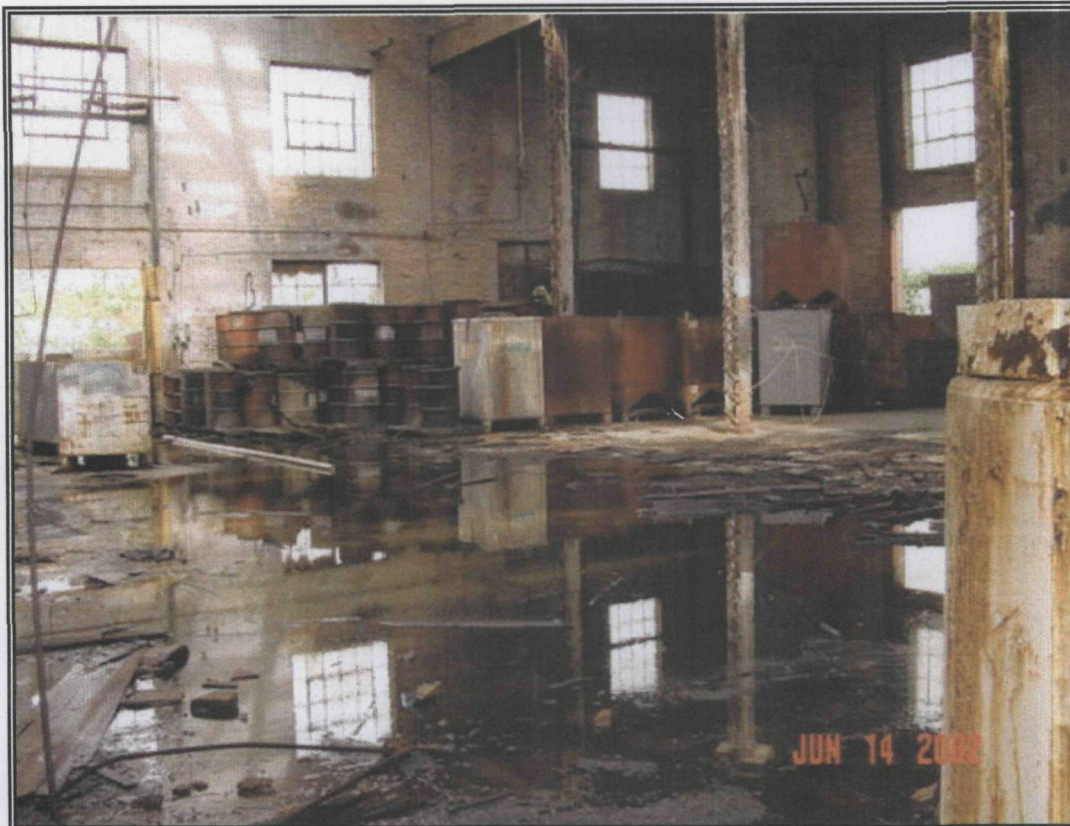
(Site Assessment Preliminary Visit, 14 June 2002) - Room 5 facing west, note the drum storage area.
